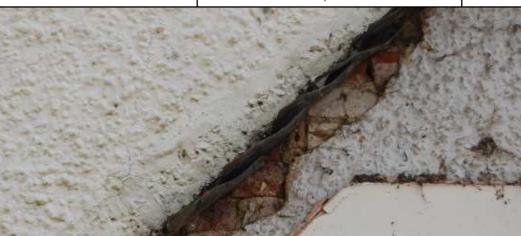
Narrow strip of brickwork exposed below the render, S end of north block
